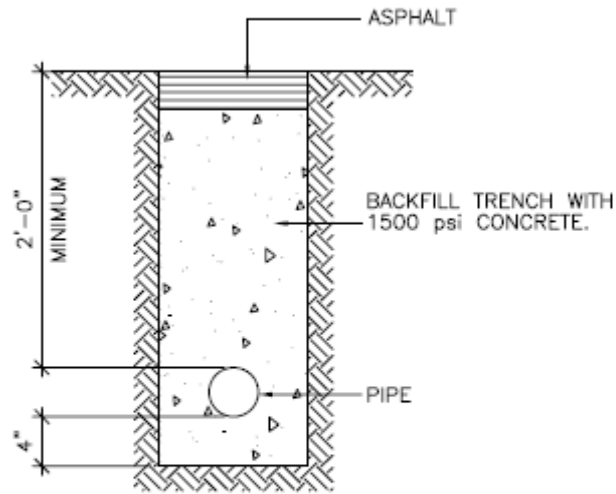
TYPICAL TRENCH DETAIL IN ROAD SHOULDER
